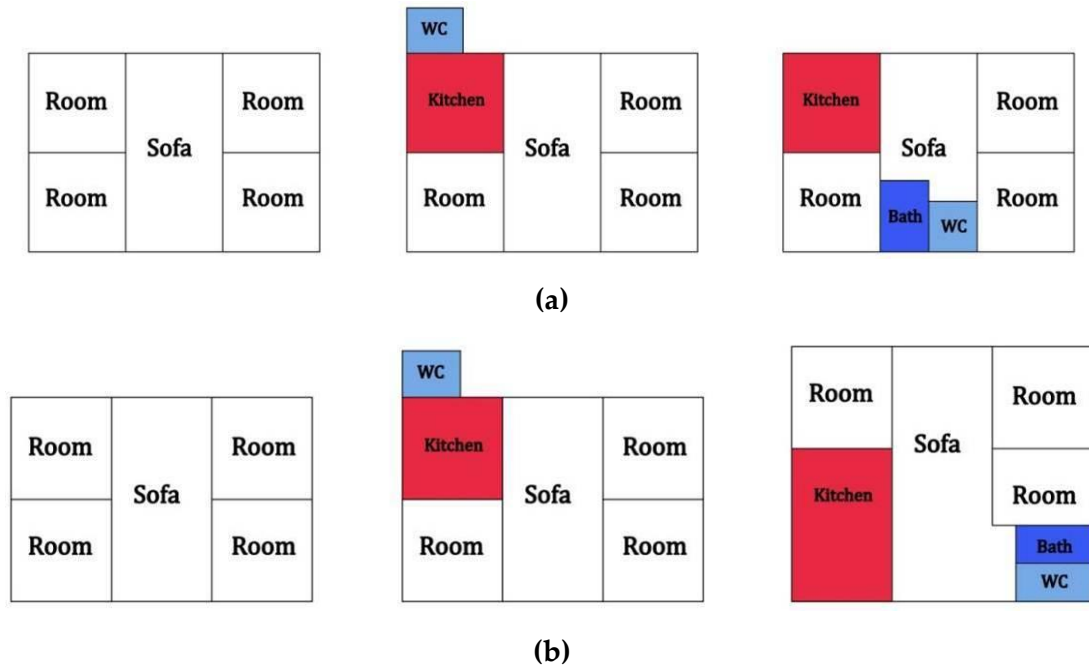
a) Plan of the new house of the village headman, b) Plan of the imam's house.
